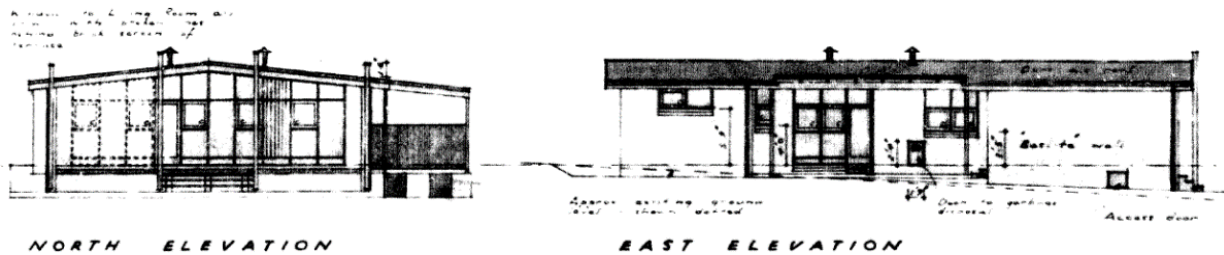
Elevations for 104 Kilby Road by architects Chas H Lacey & Associates. (Source: Building Permit 394).
